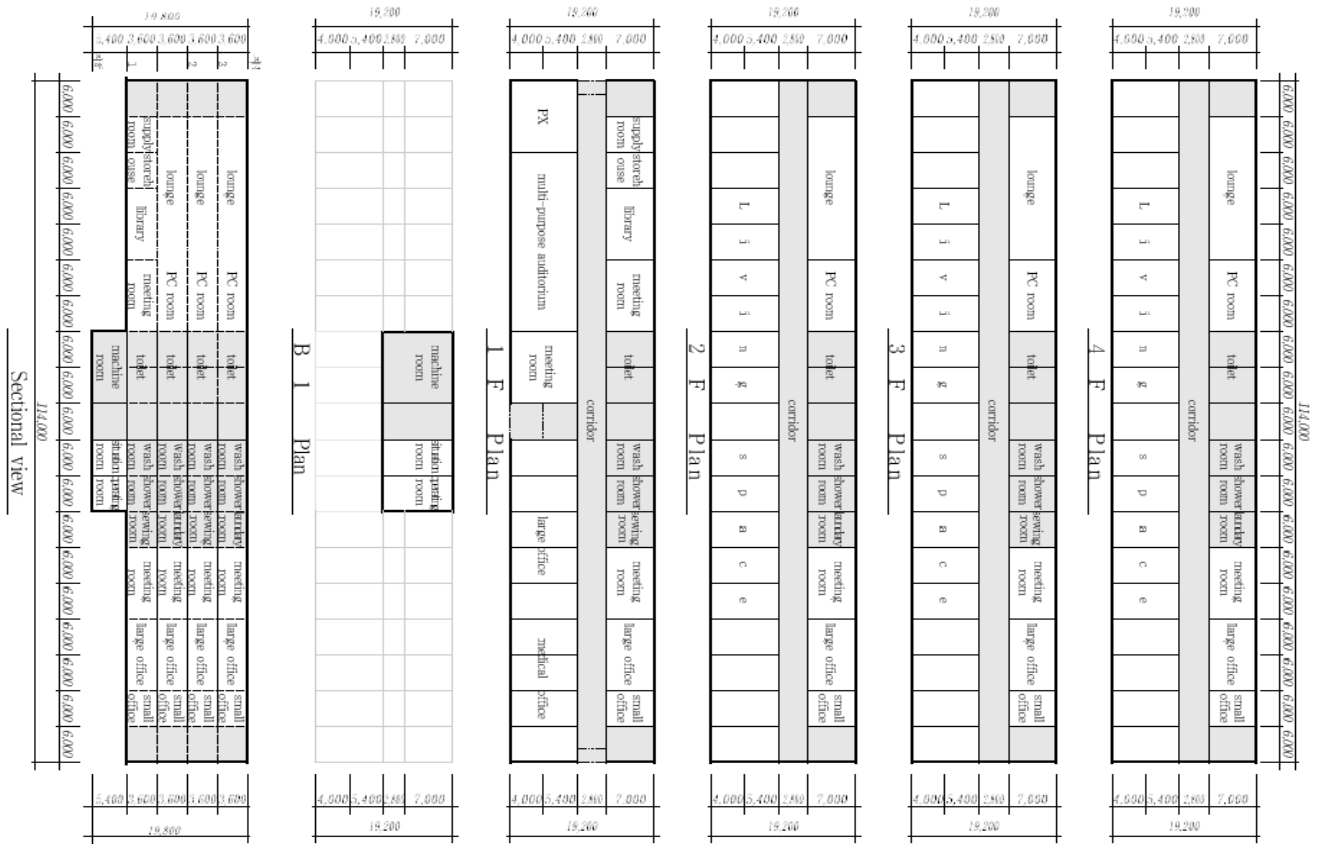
Floor plan & cross-sectional drawing for a barracks standard model
